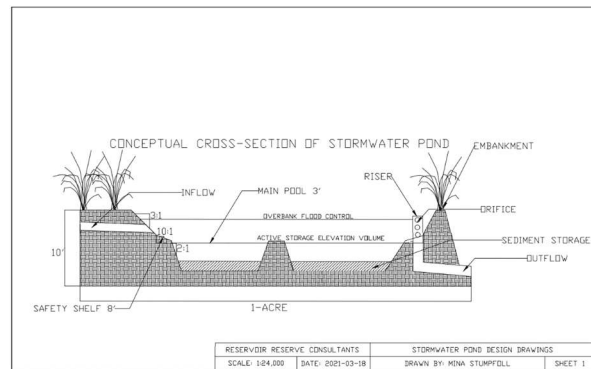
AutoCAD cross-sectional design of the proposed Stormwater Pond.
